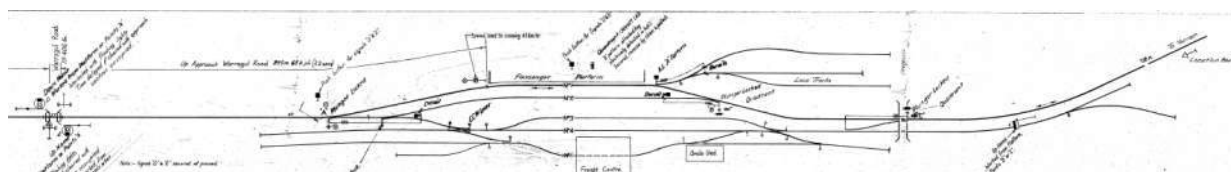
Plan of Korumburra Station signalling arrangements, 1989. (Source: South Gippsland Shire Council)
